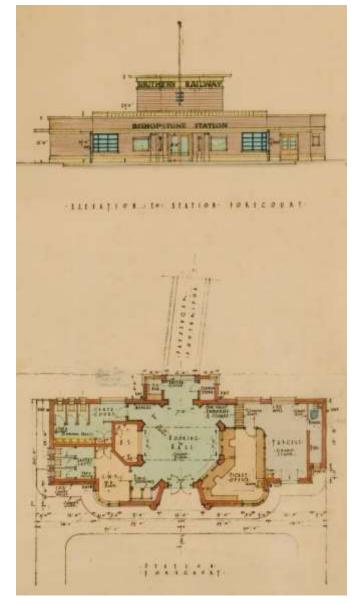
A detail from the drawings of Bishopstone shewing the front elevation and plan of the main building. Comparison with Fig 15 below reveals that the intended horizontal fenestration was not achieved. (*Courtesy Network Rail Corporate Archive*)
